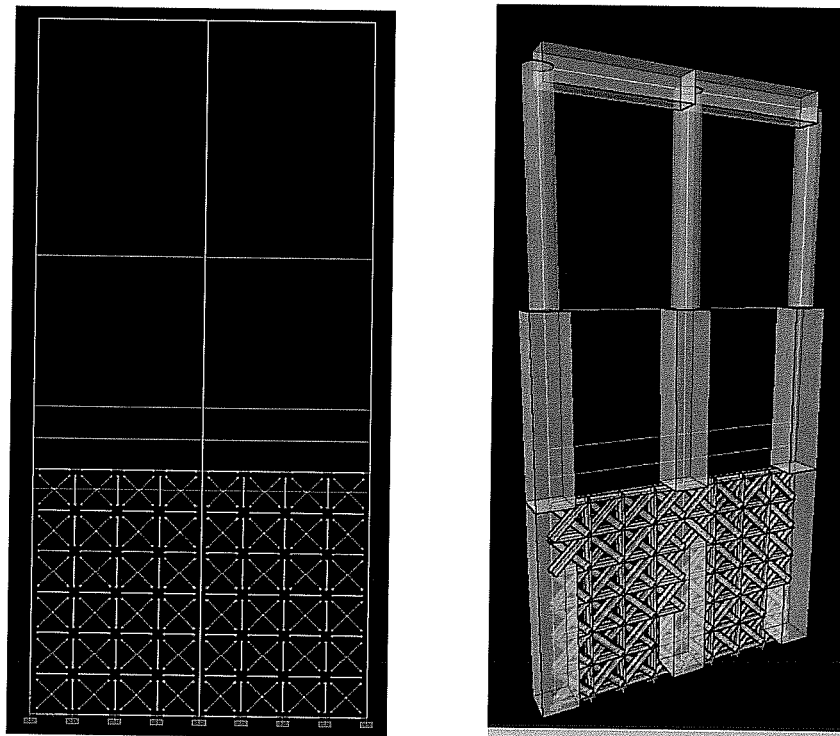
SH87 Bridge Pier with Truss-Grid Wall
